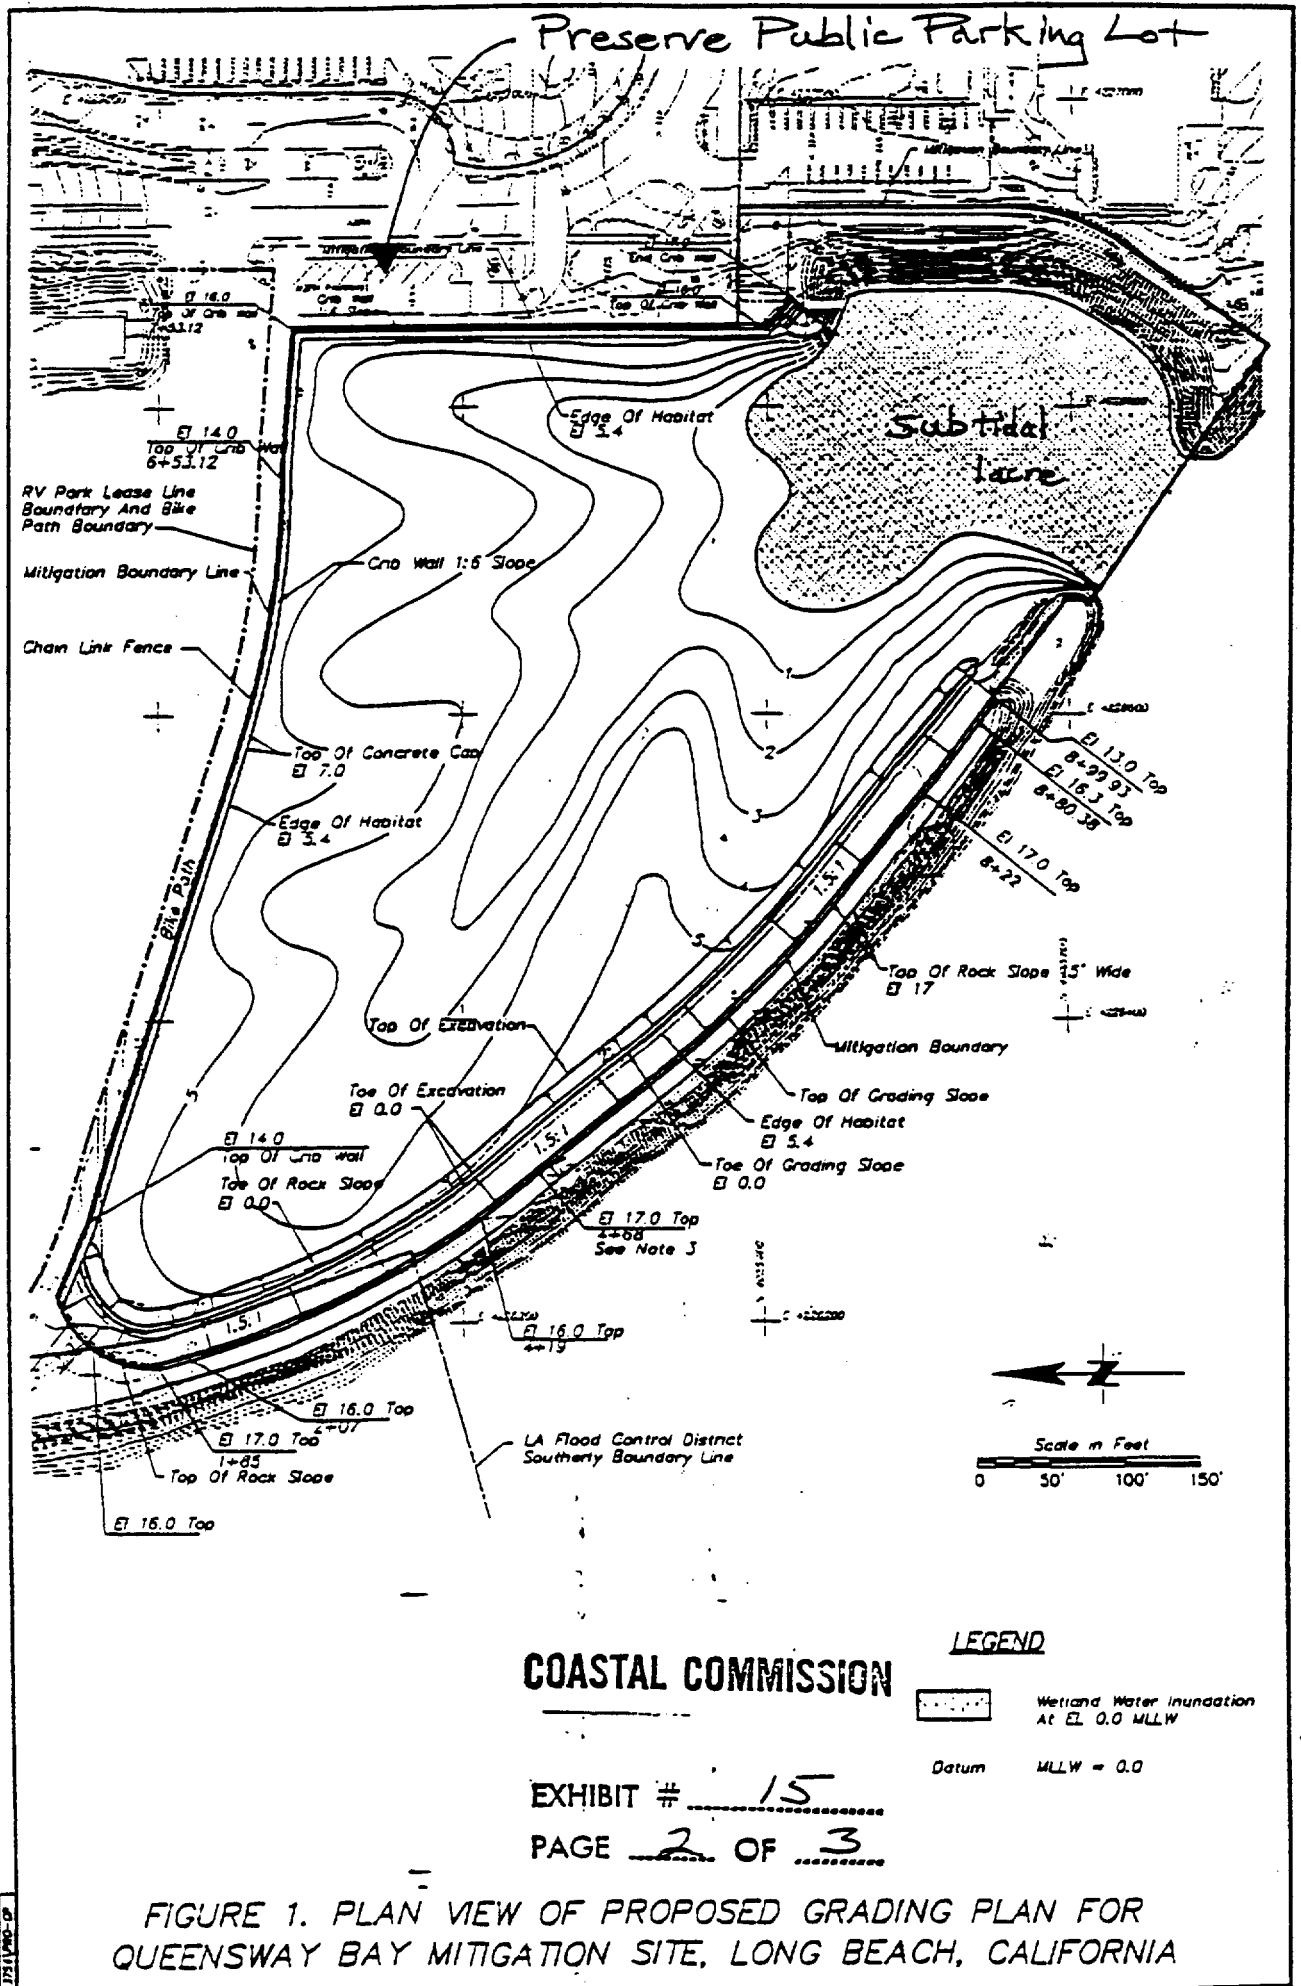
PLAN VIEW OF PROPOSED GRADING PLAN FOR QUEENSWAY BAY MITIGATION SITE, LONG BEACH, CALIFORNIA
